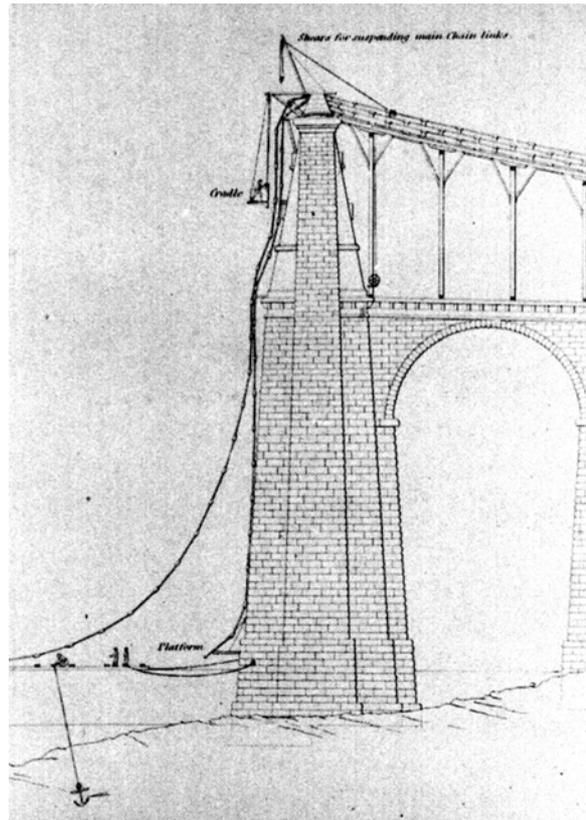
Erection of the main chains of the Menai Bridge. (Penfold, after Provis)
